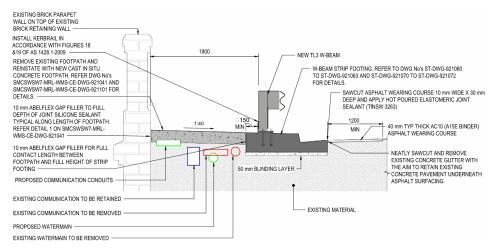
Cross section of the proposed countryside footpath behind TL3 w-beam
